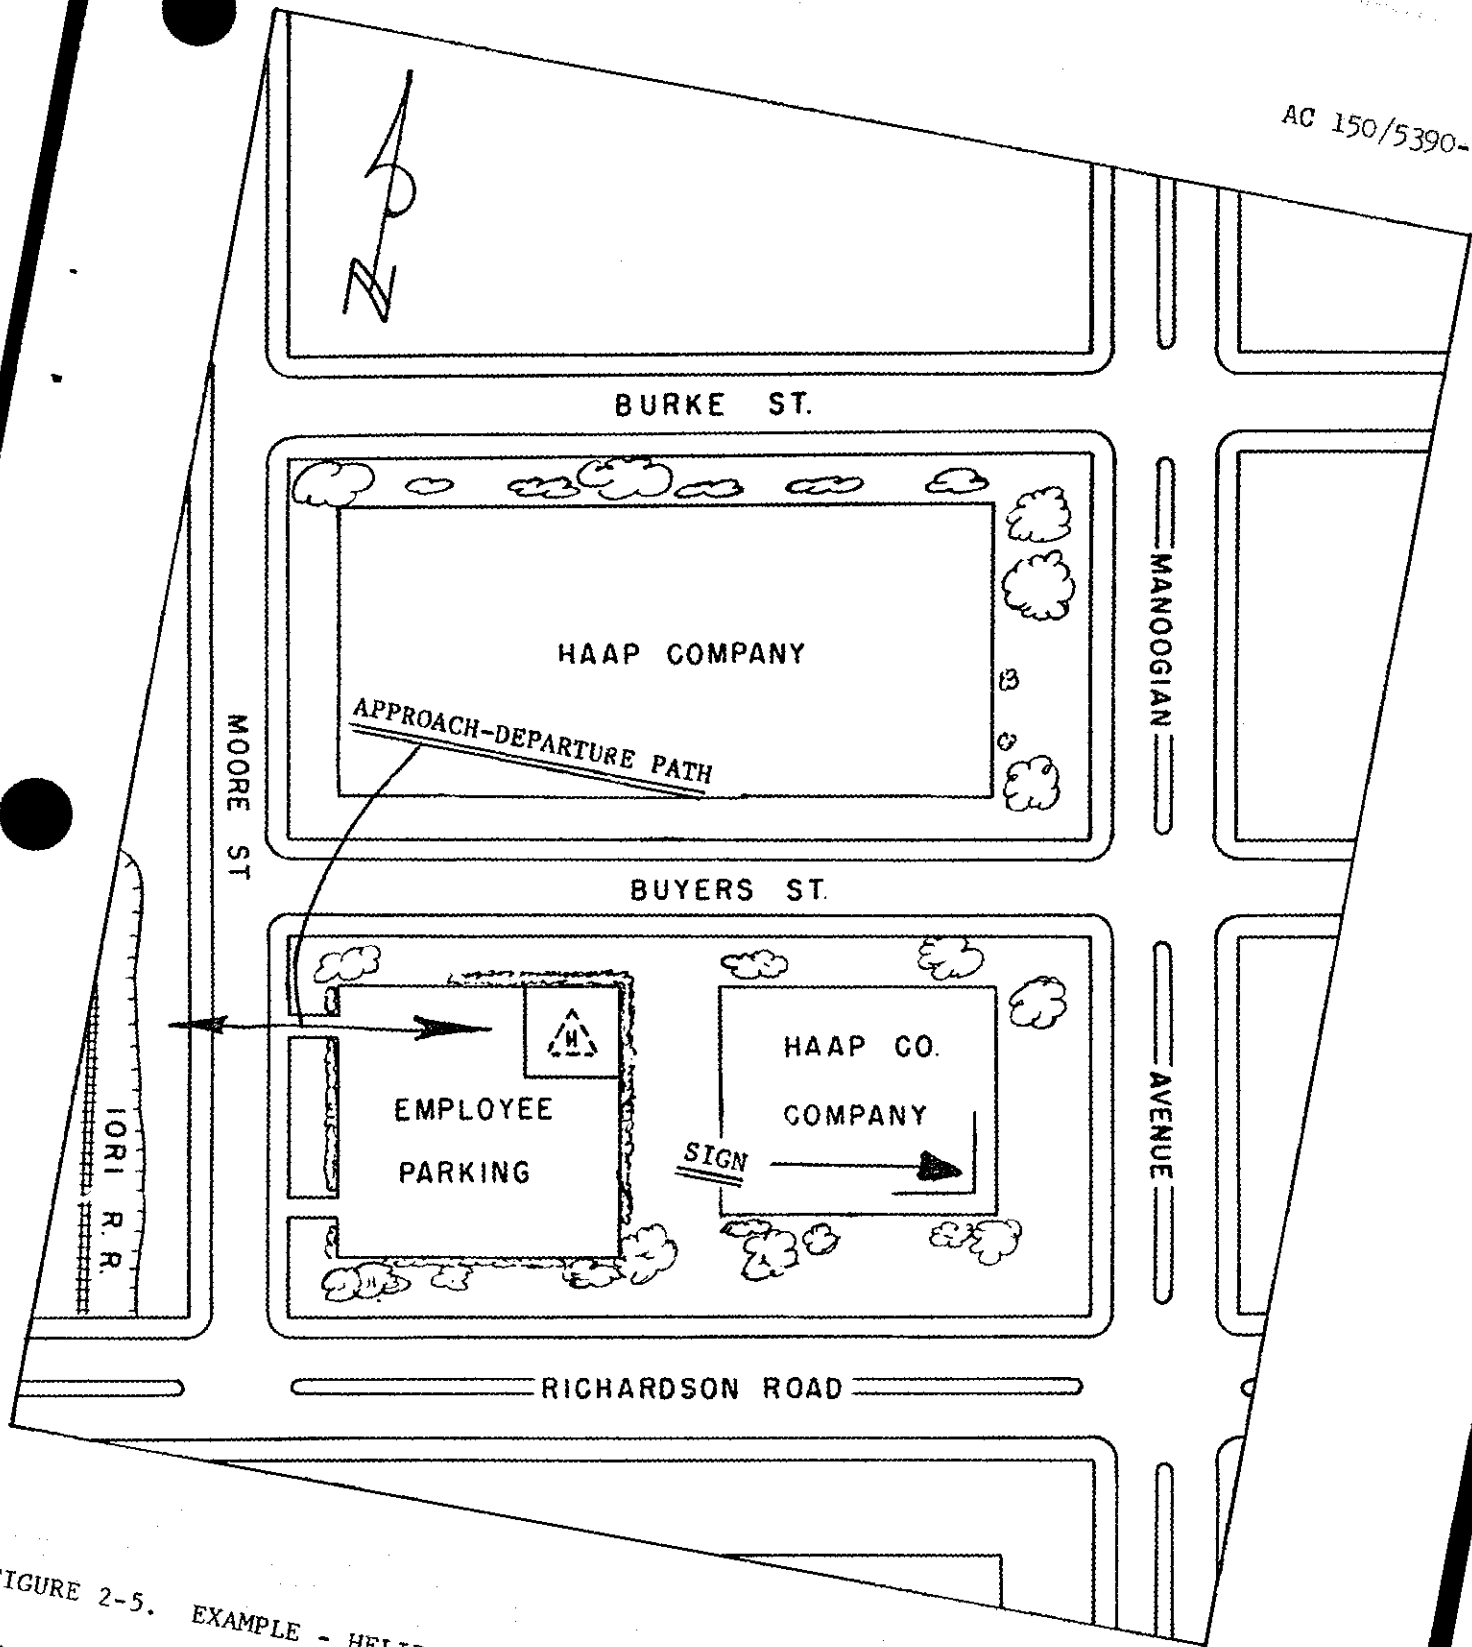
EXAMPLE - HELIPORT SKETCH SHOWING PROPOSED CONSTRUCTION LOCATION
